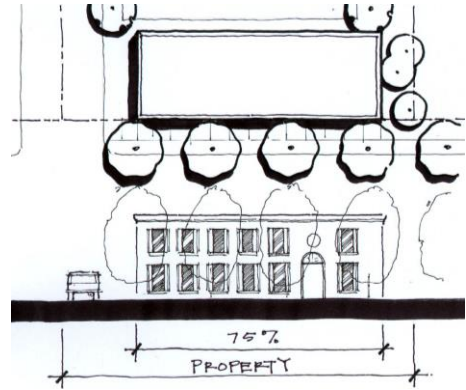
Building facades shall occupy at least 75% of the lot frontage at the front building line.
